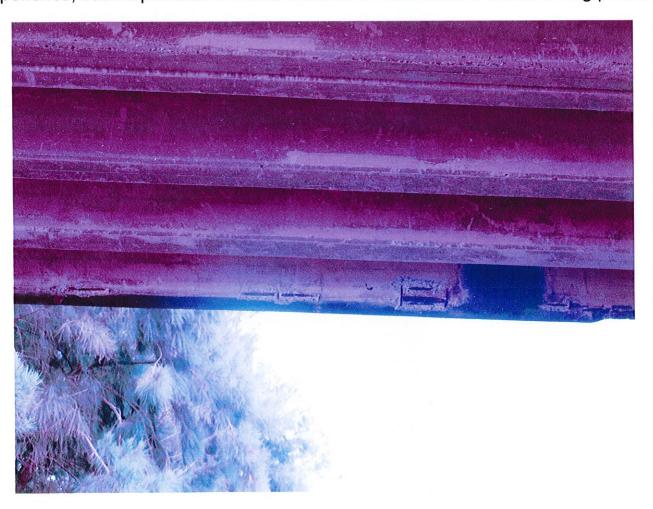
TYPICAL VIEW OF UNDERSIDE OF DECK. NOTE SOUND INTERNAL BEAMS BUT SPALLING ON UPSTREAM EDGE BEAM
